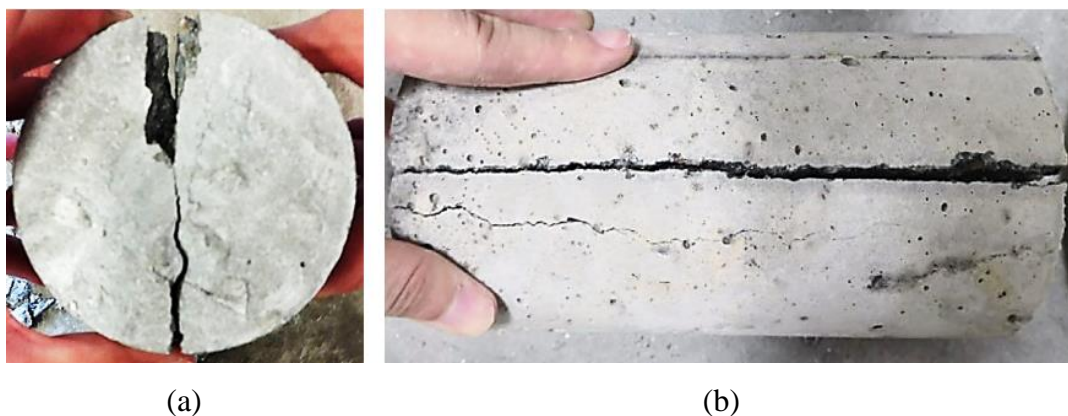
Crack Pattern of Plain Concrete Cylinder Specimen: (a) Plan View of Concrete Cylinder; (b) Side Elevation of Concrete Cylinder
